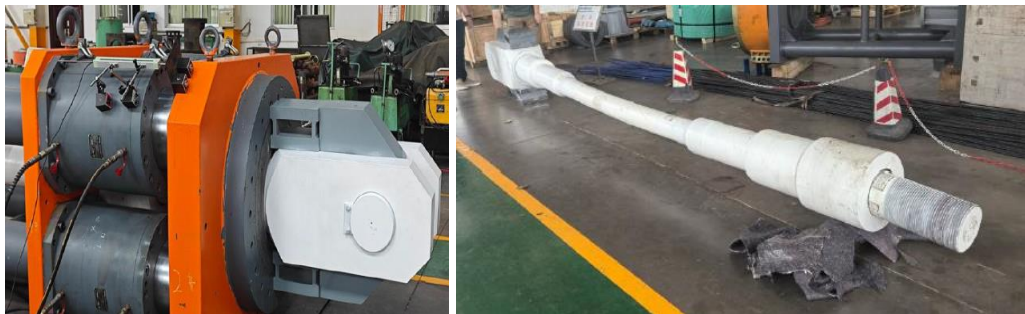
Pre-test inspection of the hanger specimen: anchorage assembly (left) and stressing-end components (right)
